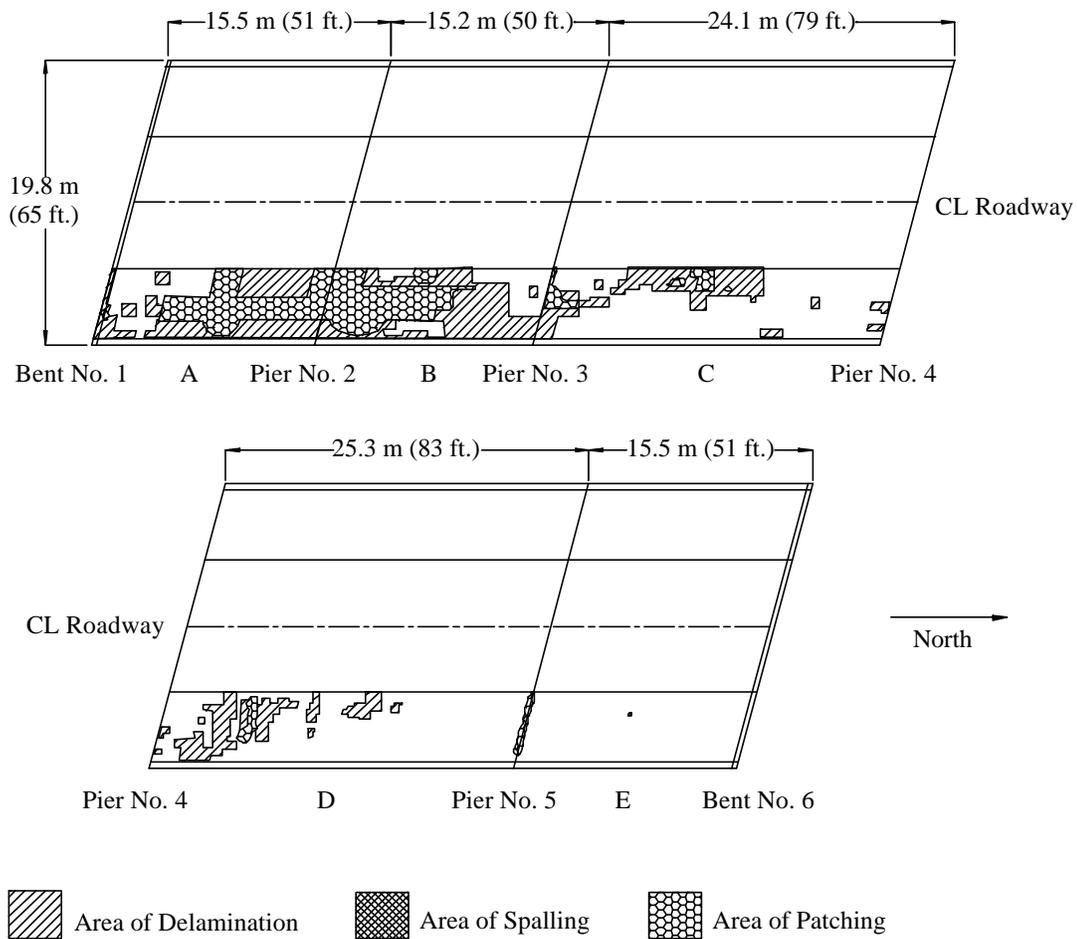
Delaminations, Spalls, and Patching Found on Structure #32-18-2182
